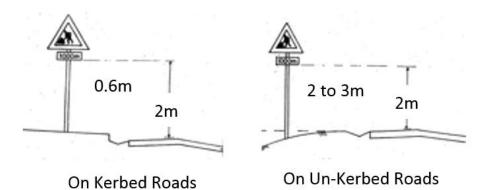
TRAFFIC DEVICES USED IN CONSTRUCTION ZONES
